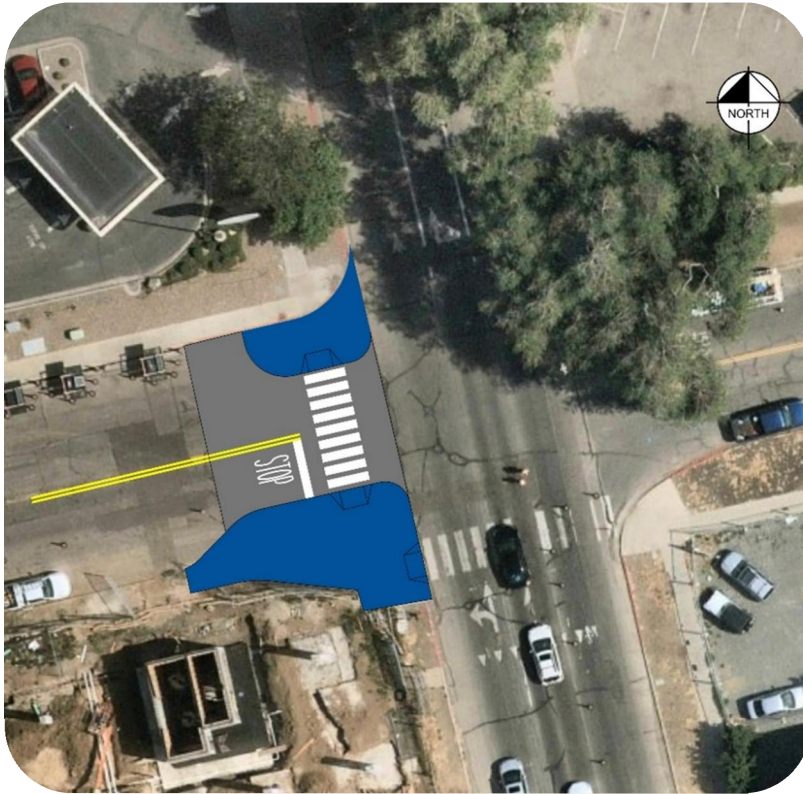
Center Street and 7<sup>th</sup> Street Conceptual Layout
